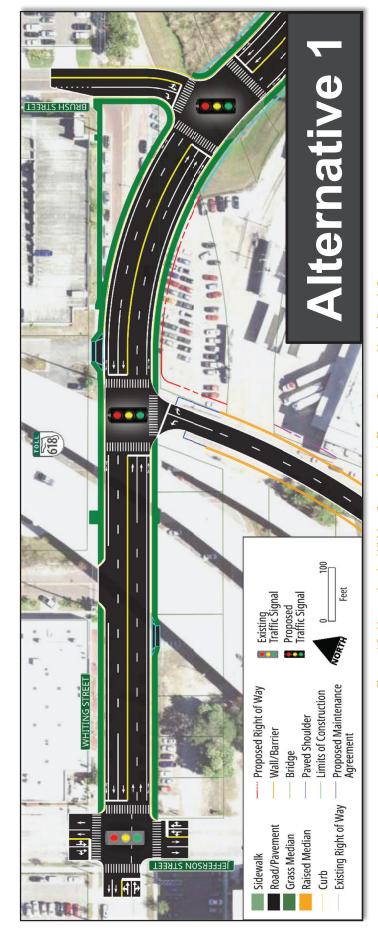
Alternative 1 – Whiting Street from Jefferson Street to North Brush Street
